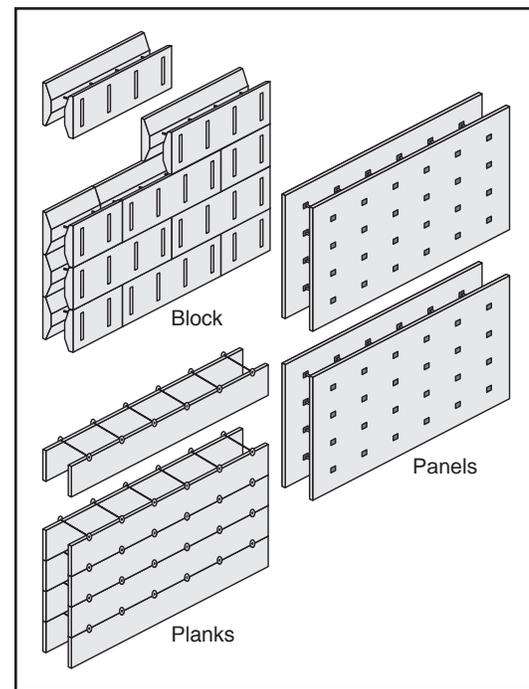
ICF walls in 3 basic form-types: block, panels, and planks
